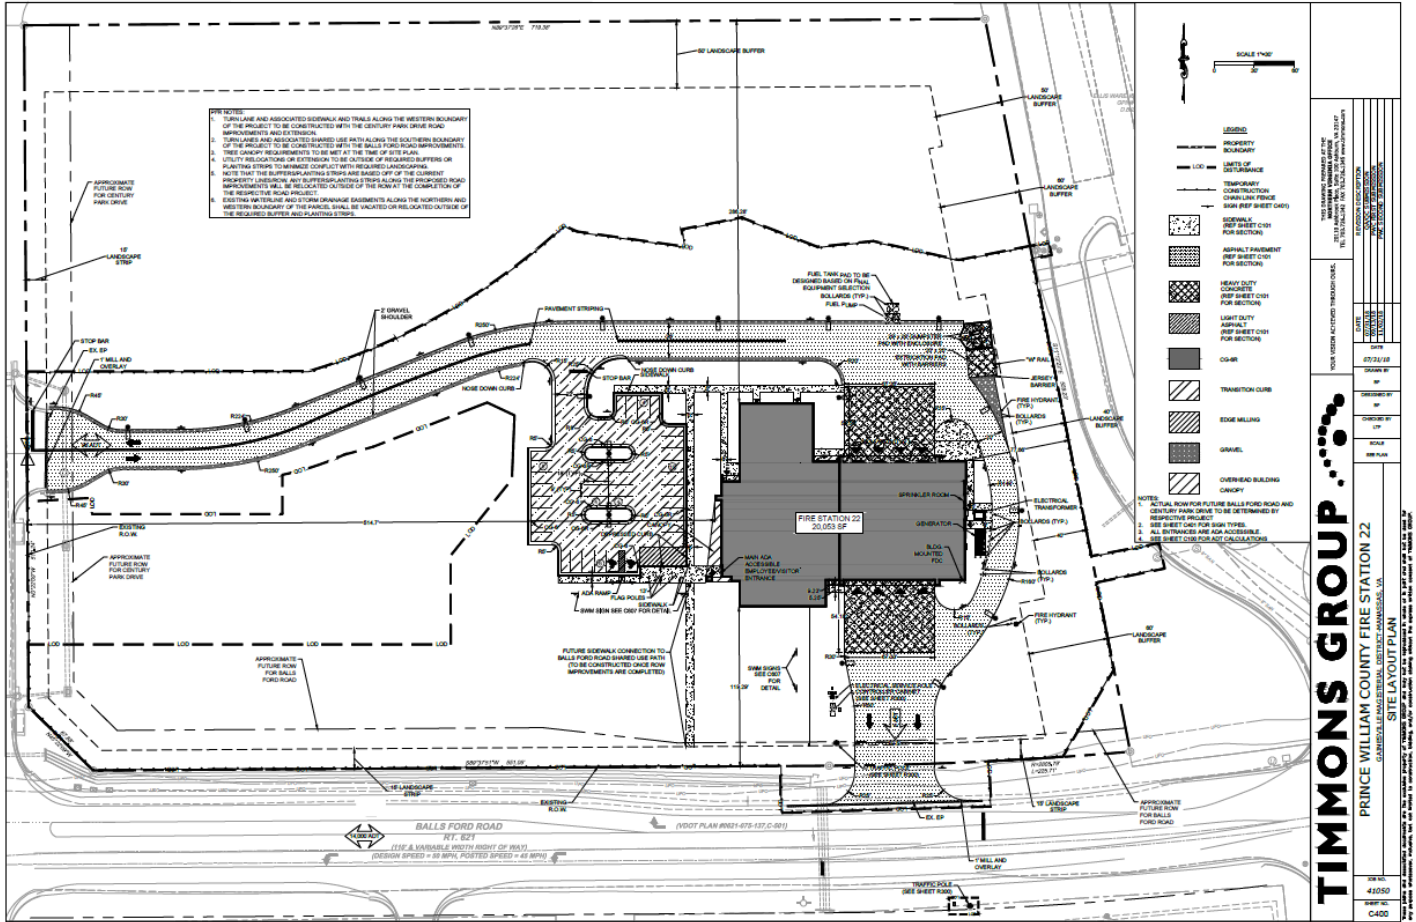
3.5.23 PFD Page 4 - Site Layout Plan
